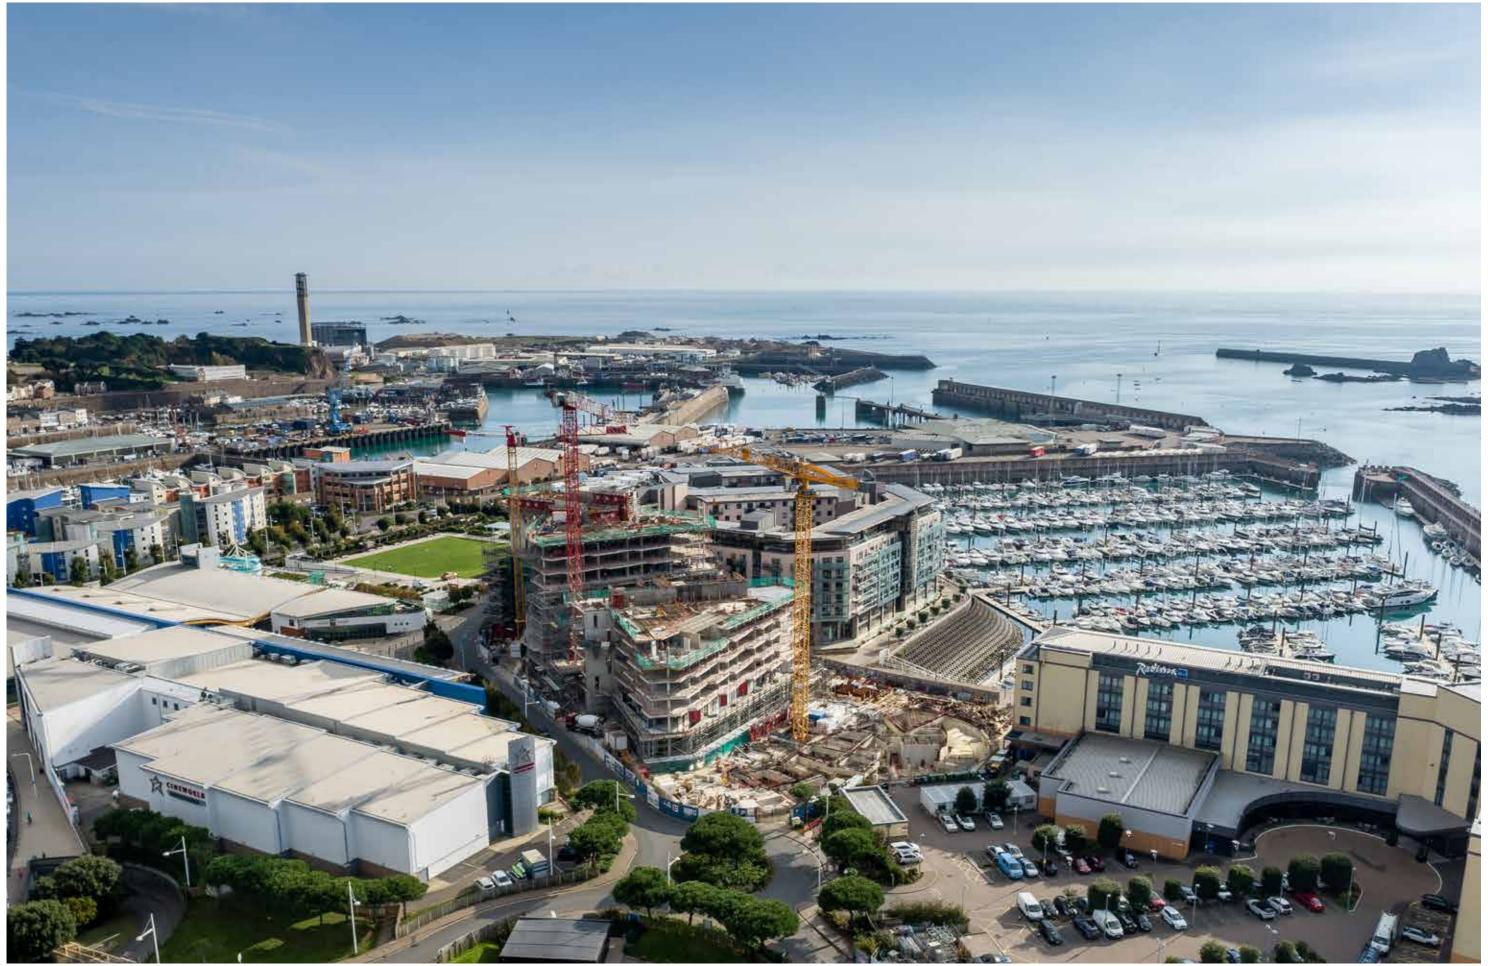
Aerial photo looking towards Rue de L'etau and Marina Gardens
